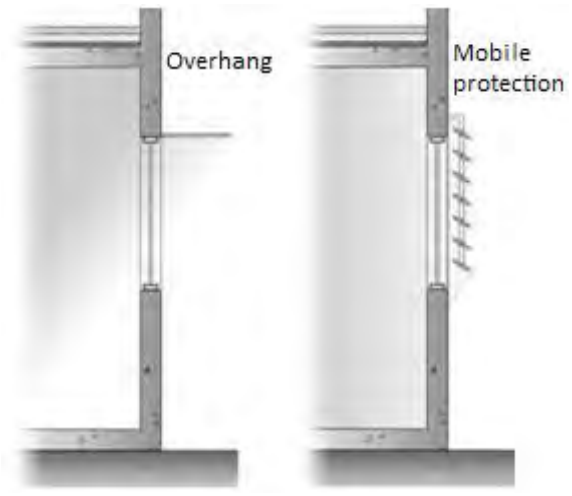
Some constructive elements can be designed to provide solar protection on roofs and façades, protection from the rain and creation of transition spaces (left); protection devices may be fixed or mobile and adapted to the different conditions depending on the orientation
